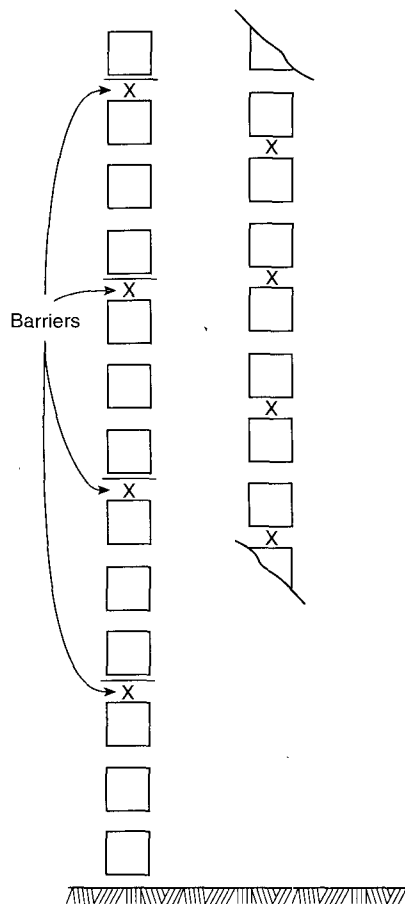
(a) In-rack sprinkler arrangement, Group A plastic commodities, single-row racks, storage height over 25 ft (7.6 m).
